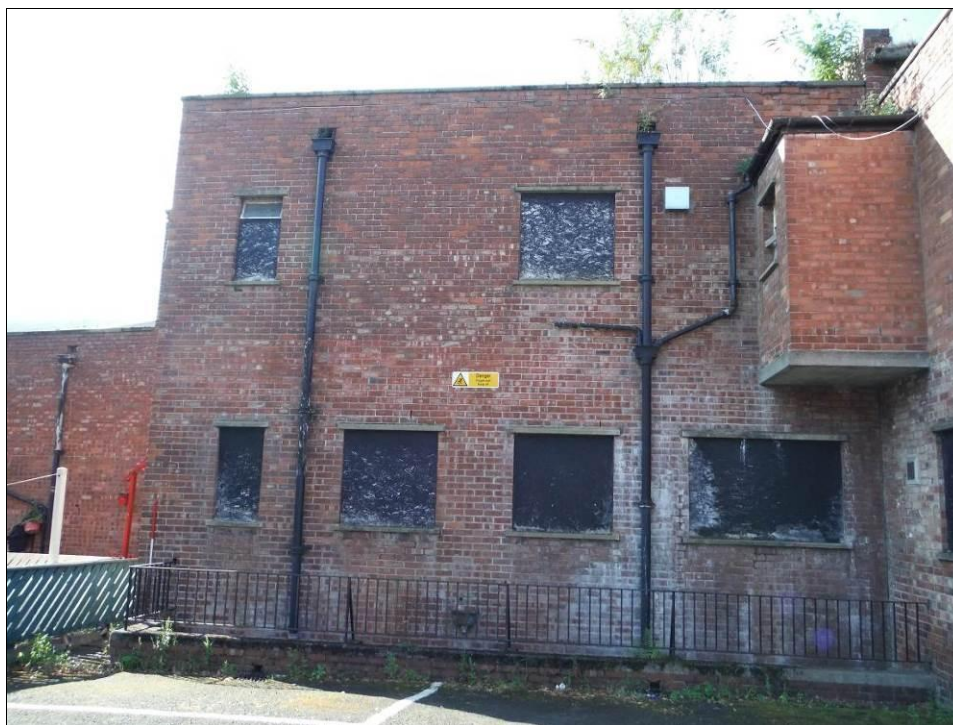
Detail of the North West elevation of Building B (Scale = 2m).
